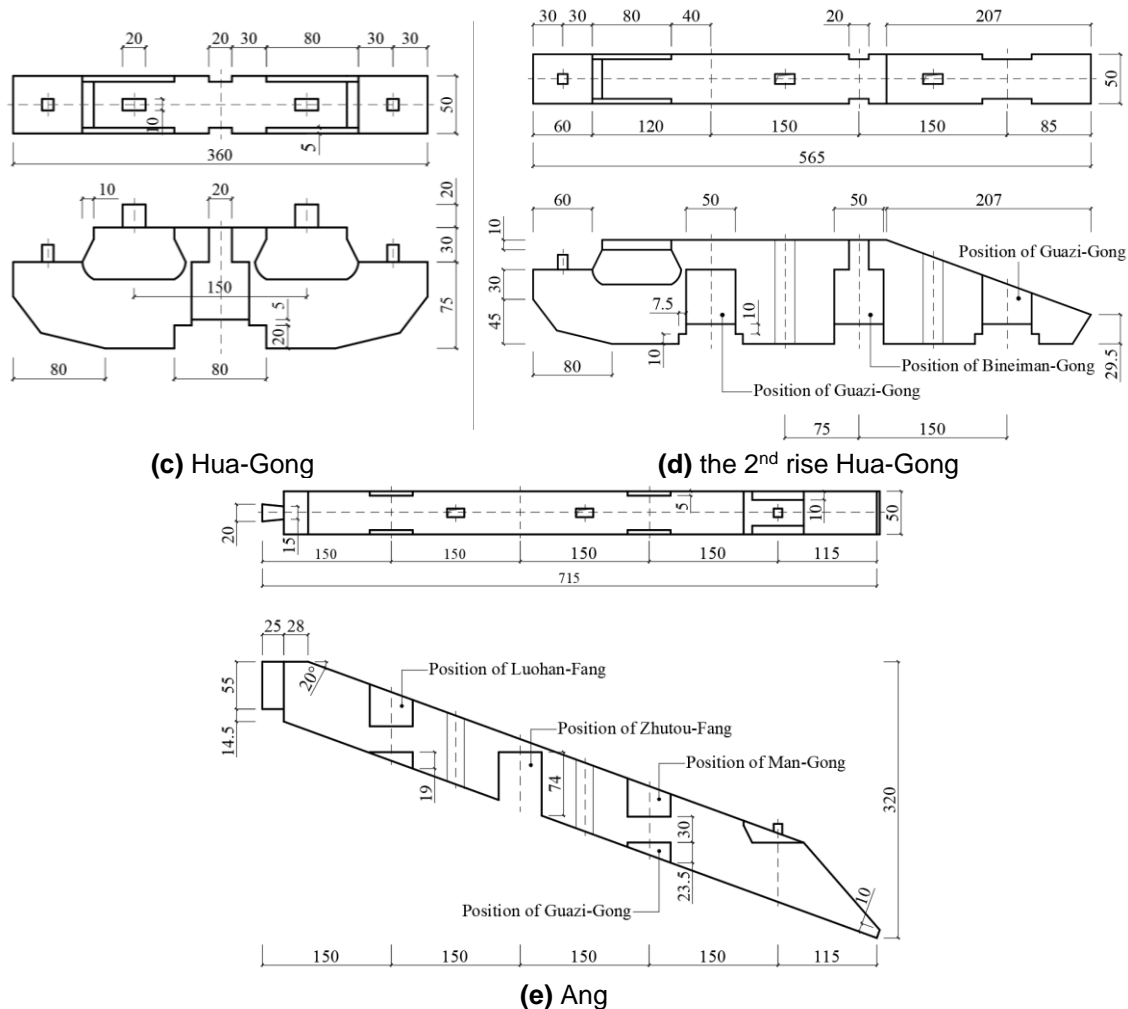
Dimensions of partial components (all dimensions are in mm)
